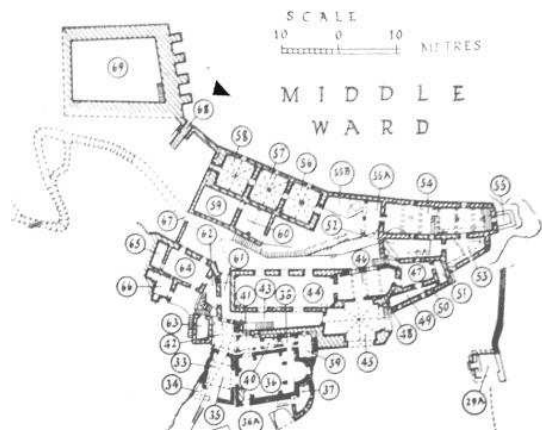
Department of Antiquities Plan, detail showing the postern n. 68 (Megaw, 1963).
